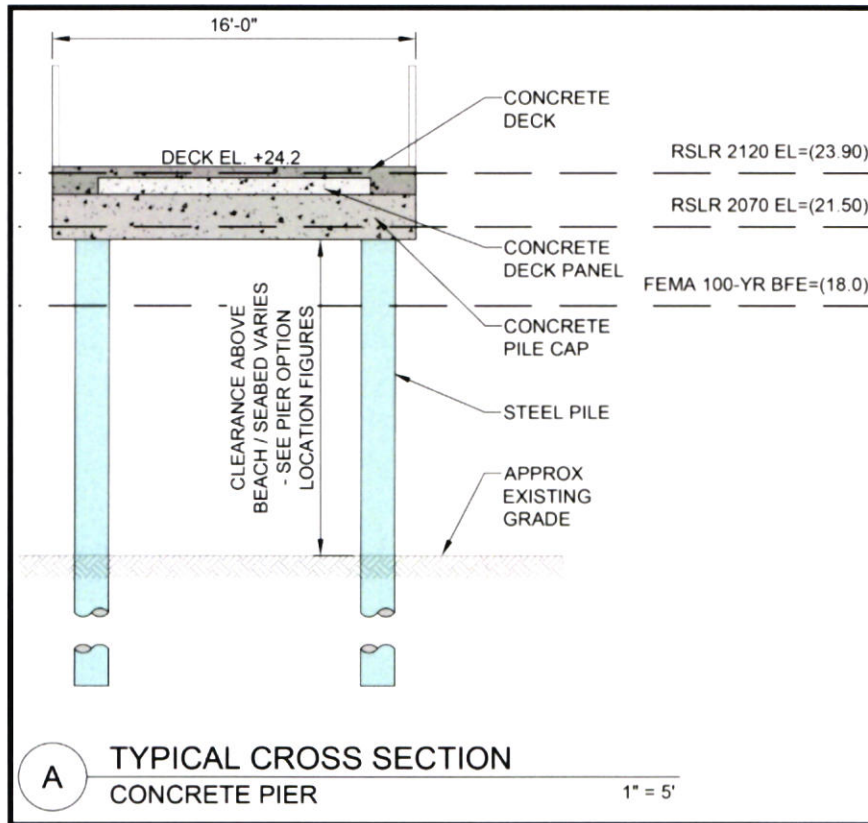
Proposed Precast Concrete Pier Conceptual Cross Section
